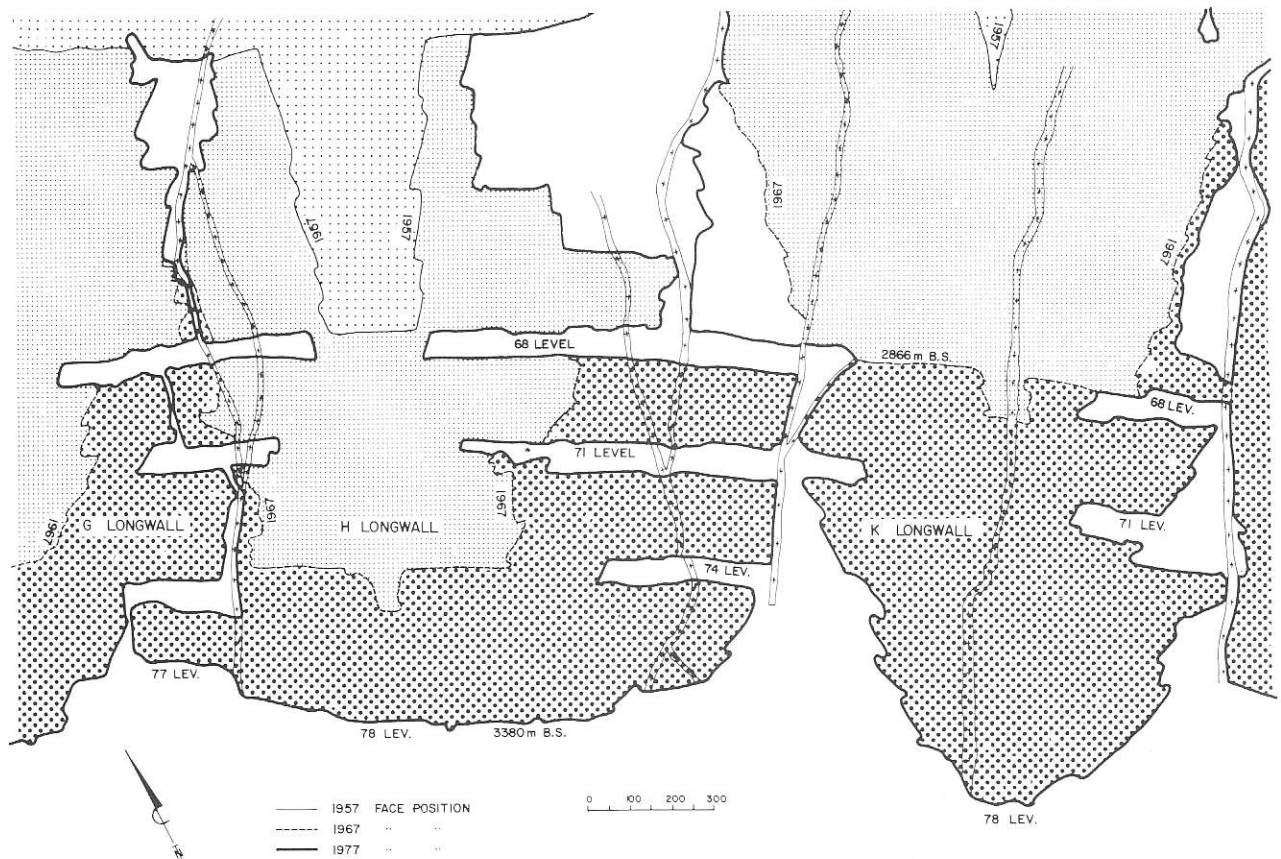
Plan of E.R.P.M., showing the K section longwalls, and, on H Section, the stabilizing pillars below 68 level and the 1957 longwalls above 68 level
